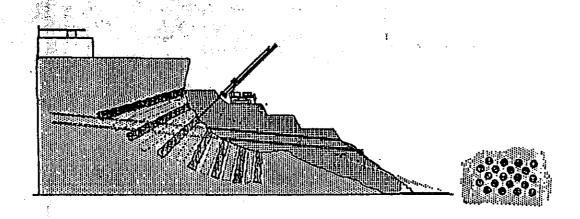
HILLSIDE STABILIZATION BY JET GROUTING
